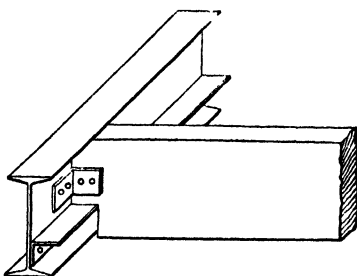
Wooden Beam Framed to I Beam with Shelf-angle
